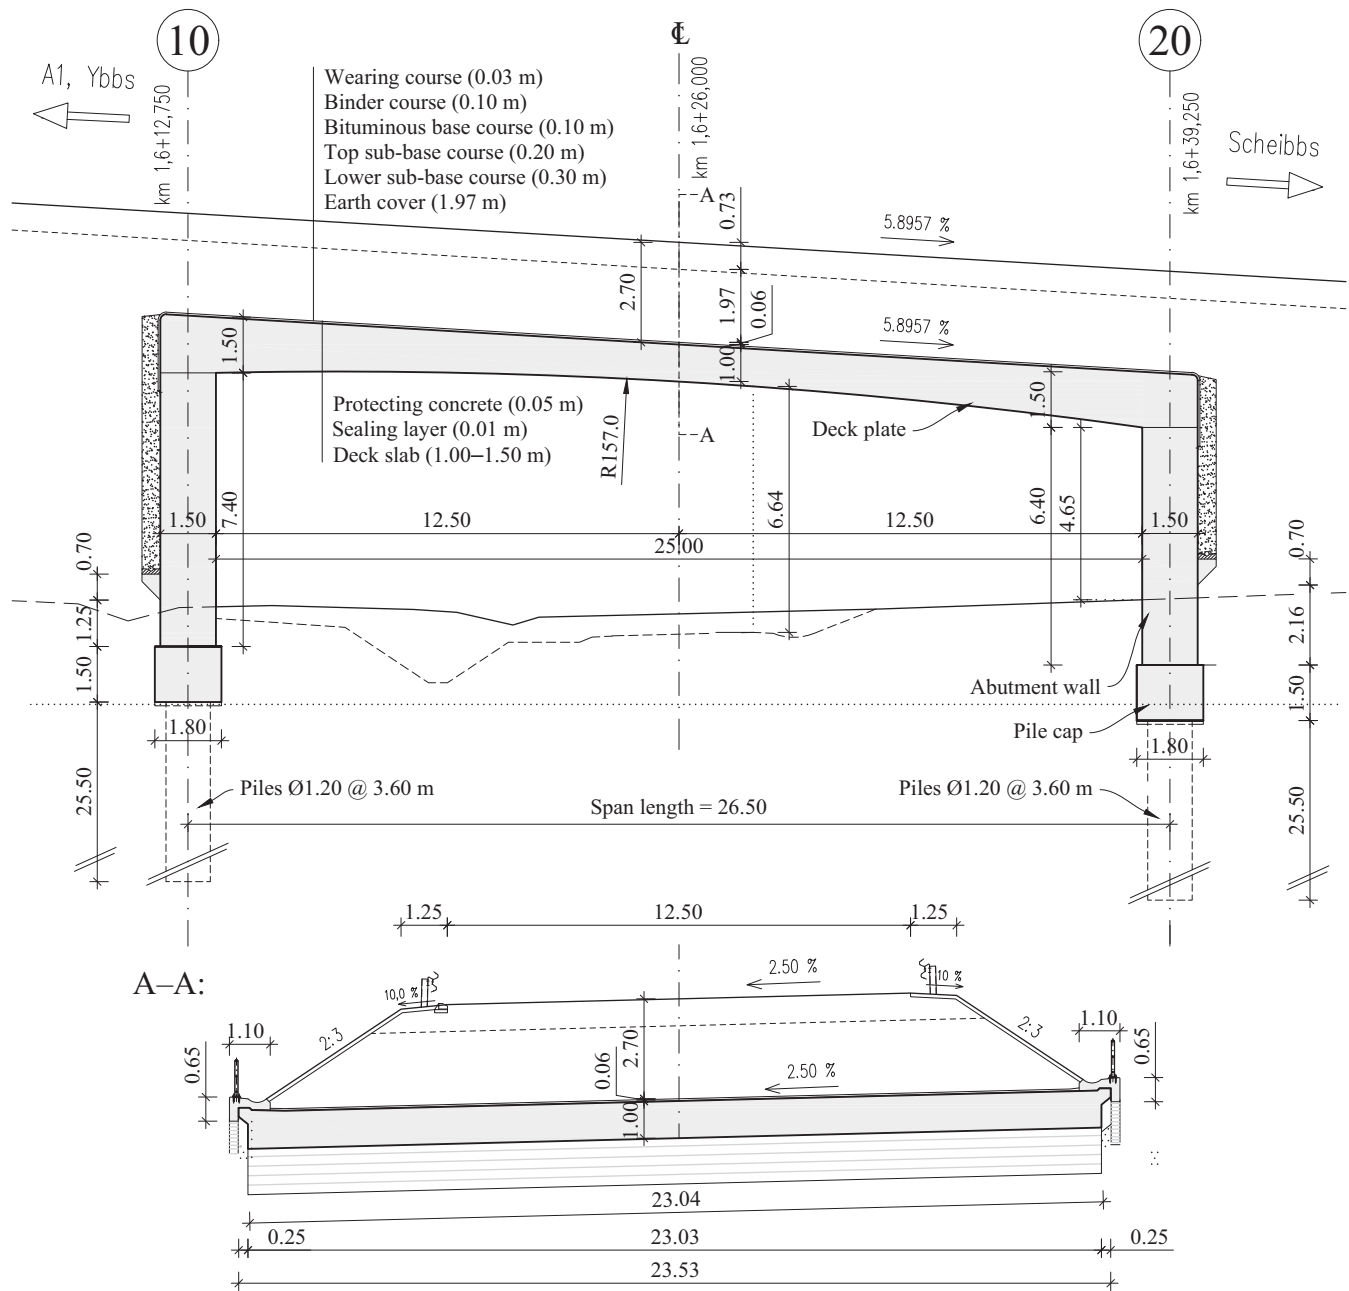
Longitudinal and transverse sections of the Wieselburg Bridge deck slab.
